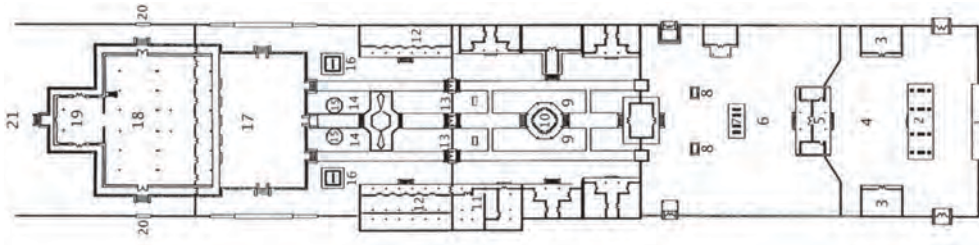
The layout of the Great Mosque of Xi'an. (1) screen wall (2) wooden pailou (3) side gate (4) first courtyard (5) gate (6) second courtyard (7) stone paifang (8) stele pavilion (9) third courtyard (10) Shengxinlou (11) hall for ablutions (12) lecture hall (13) conjoined stone gates (14) Yiyzhi Pavilion (15) hexagonal pond (16) stele pavilion (17) yuetai (18) prayer hall (19) yaodian (20) screen wall (21) location of screen wall. (Steinhardt, China's Early Mosques, 2015)
